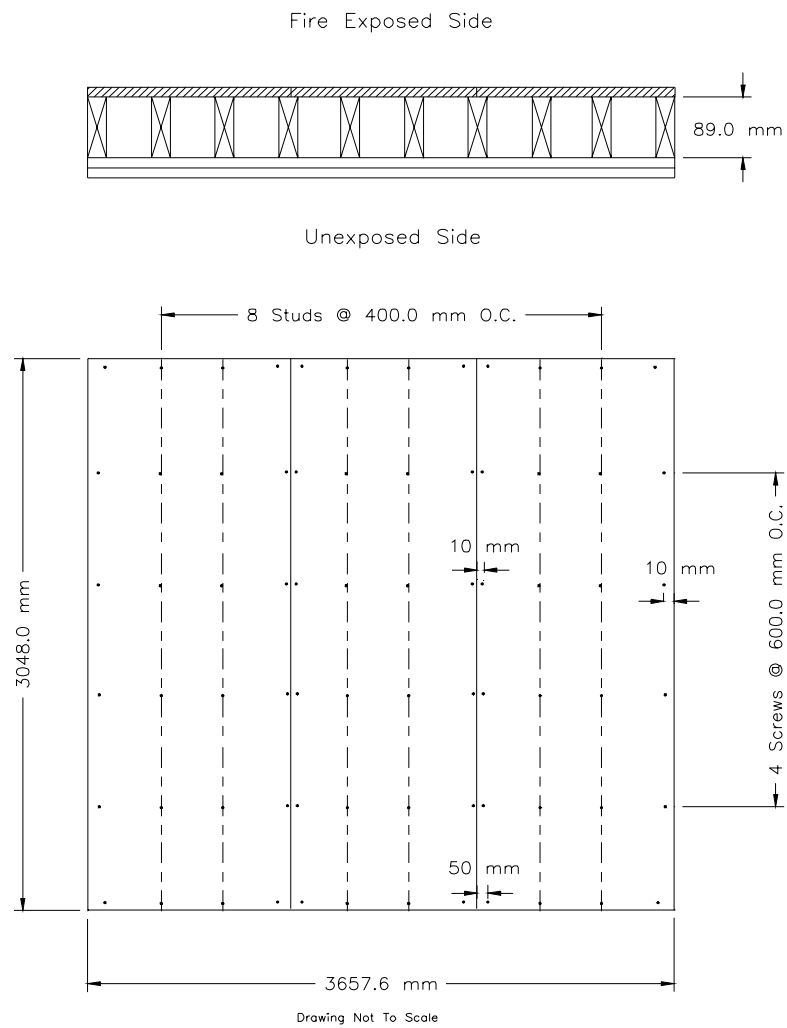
Screw Locations for wood Stud, 1x2 Gypsum Board Layers,
